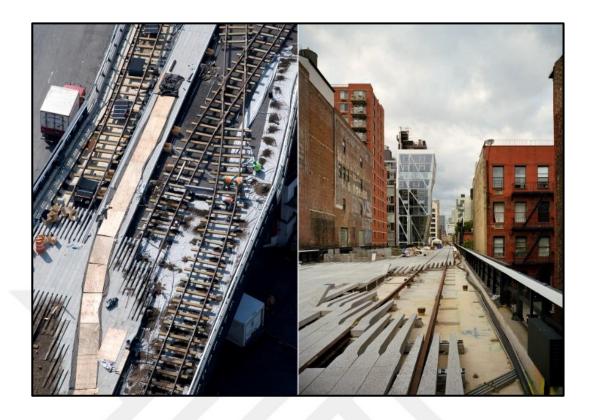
Existing rail tracks were treated and reinstalled to their previous places to be used as planting elements [267]
